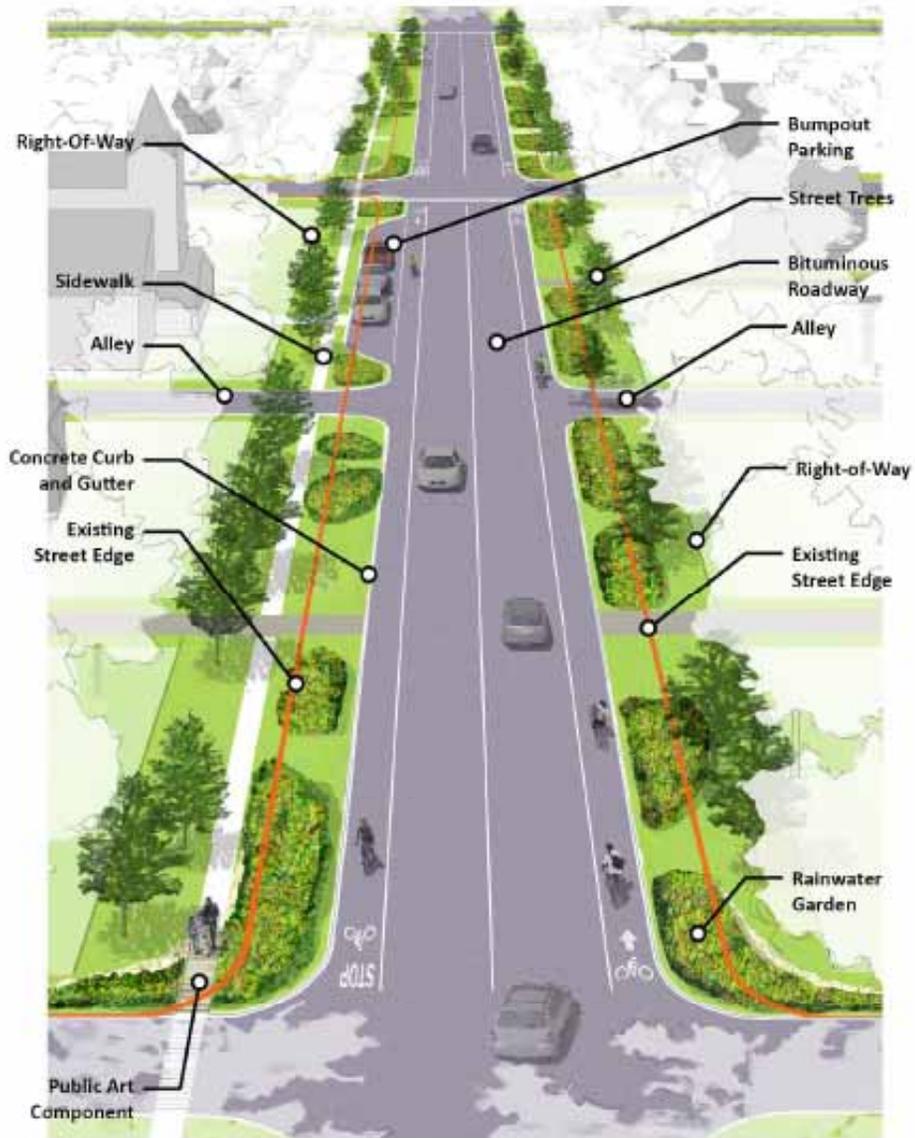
COLLECTOR STREET - RWMWD/BARR REPOF
